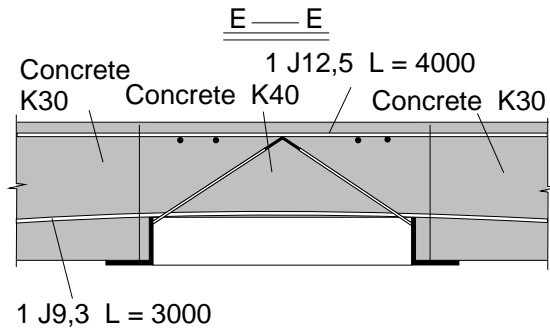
Section along outer edge of floor specimen, see Fig. 2.
